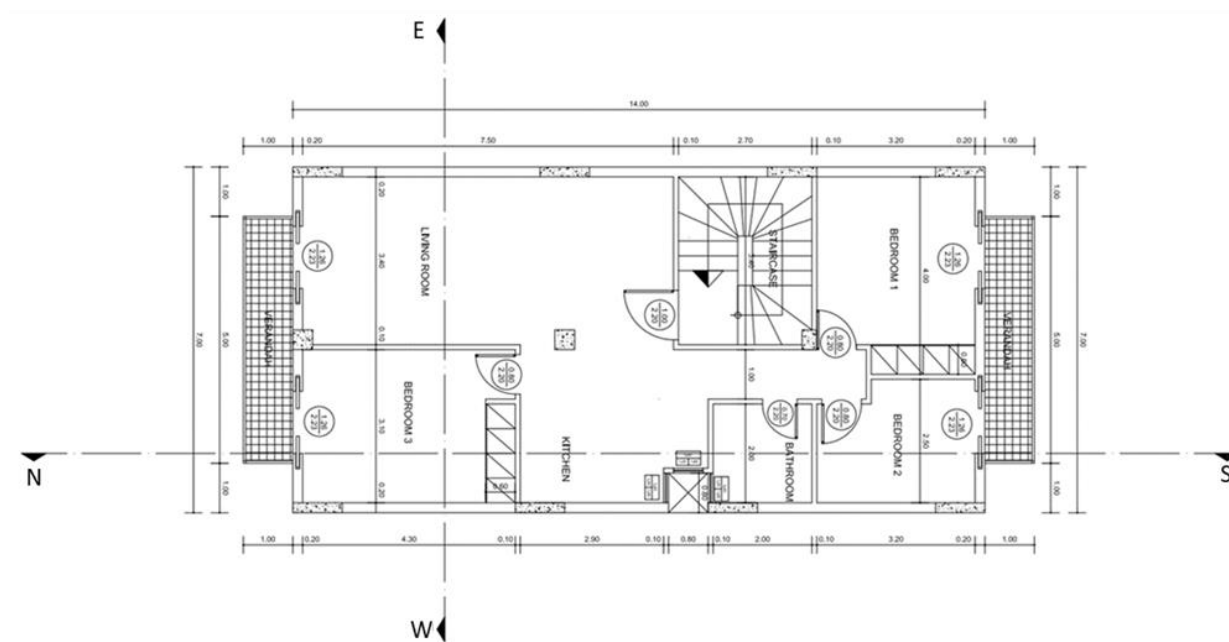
Floor plan of the Greek demo case – first floor apartment
